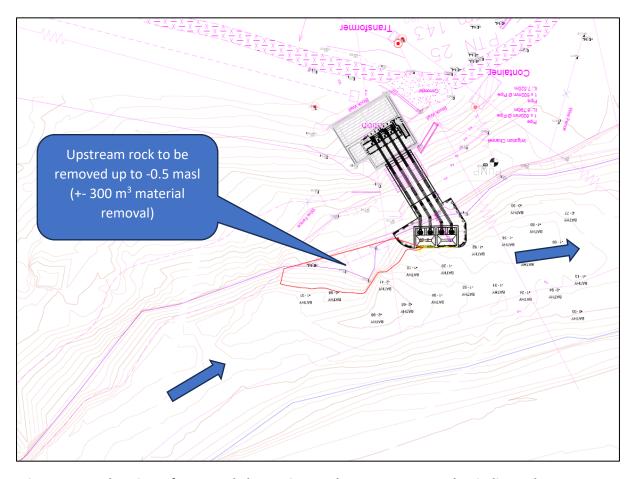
Plan view of proposed abstraction works on 2025 survey that indicate the upstream rock obstruction that needs to be removed
